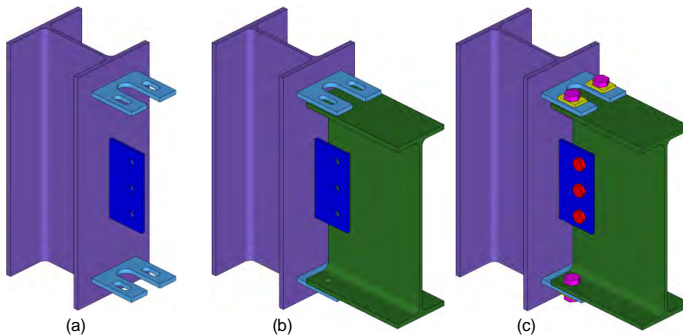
Enhanced single-plate shear connection: (a) U-shaped slotted top and seat plates welded to column; (b) beam in position; (c) bolted with rectangular plate washers.
